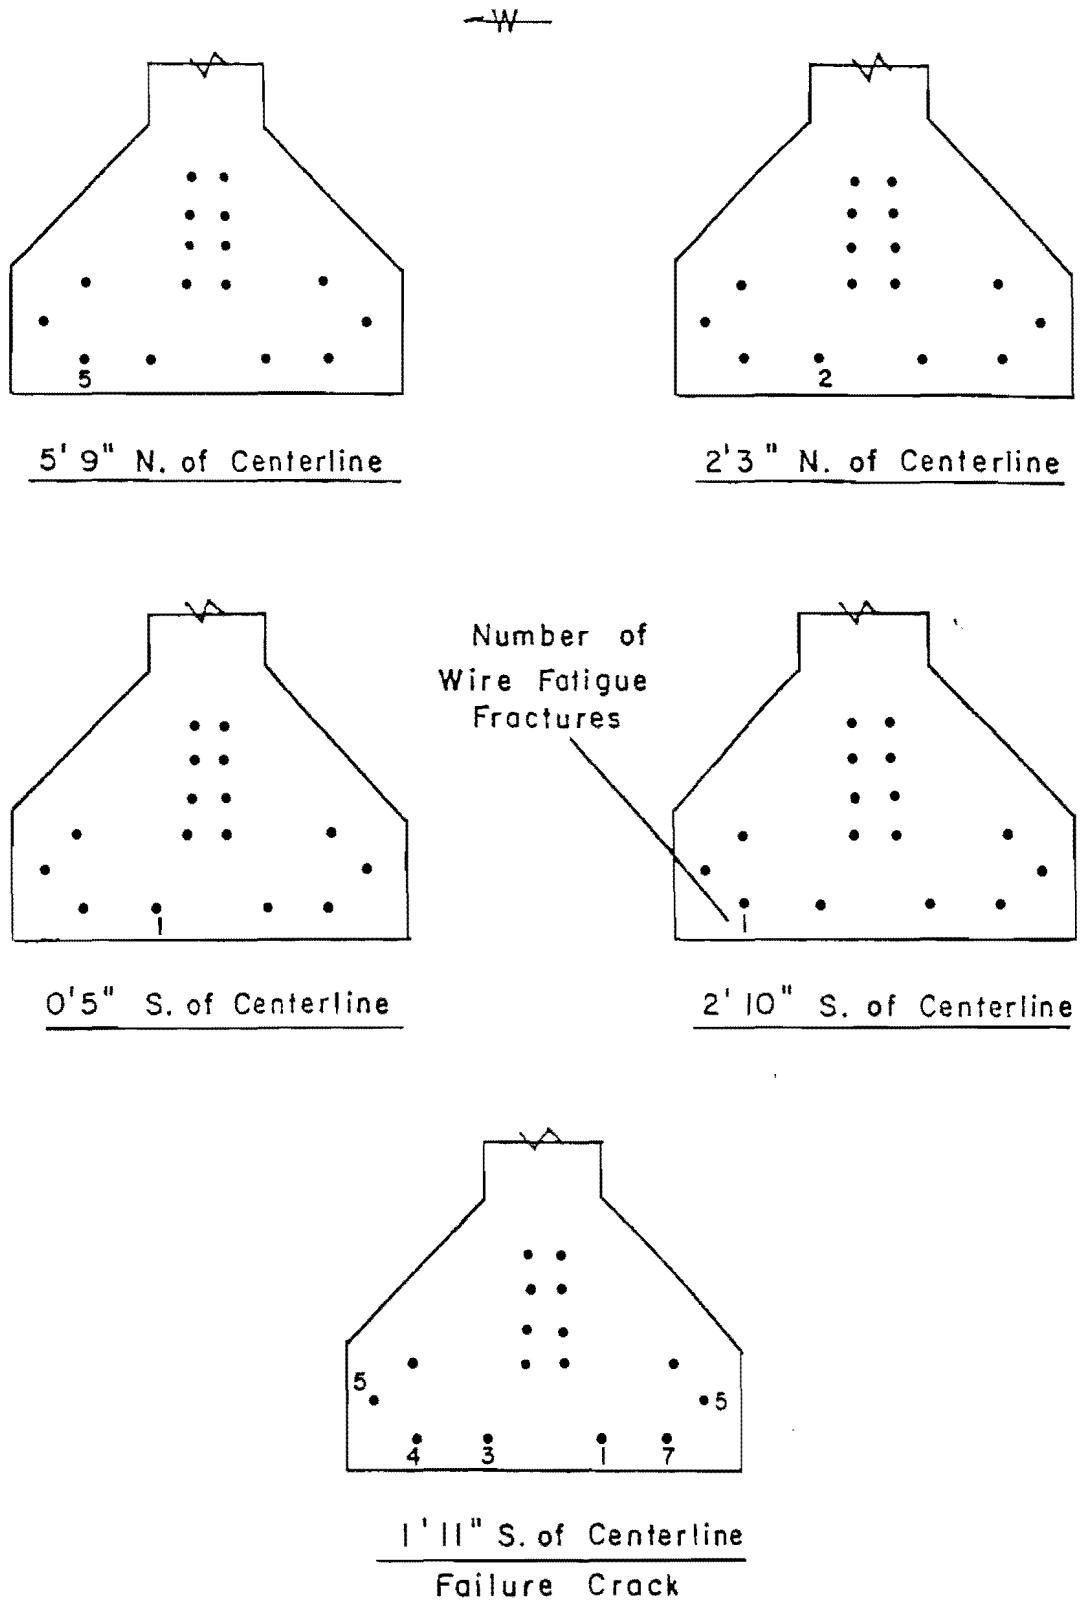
Fatigue fracture locations for Specimen C-16-NP-6.0-NO-1.91
